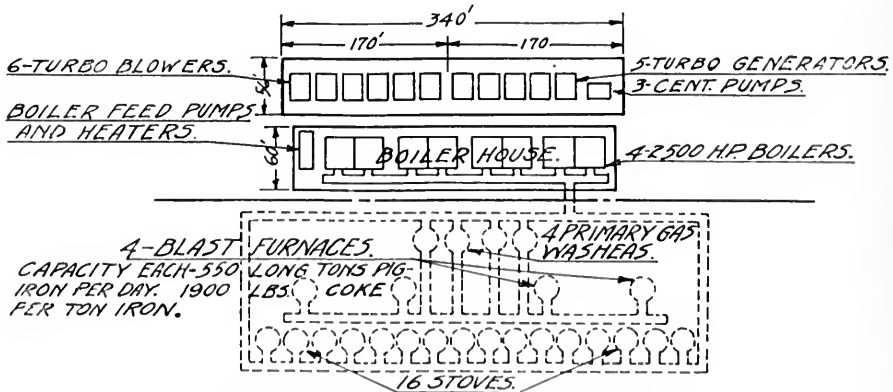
Layout of Four-furnace Steam-turbine Plant
